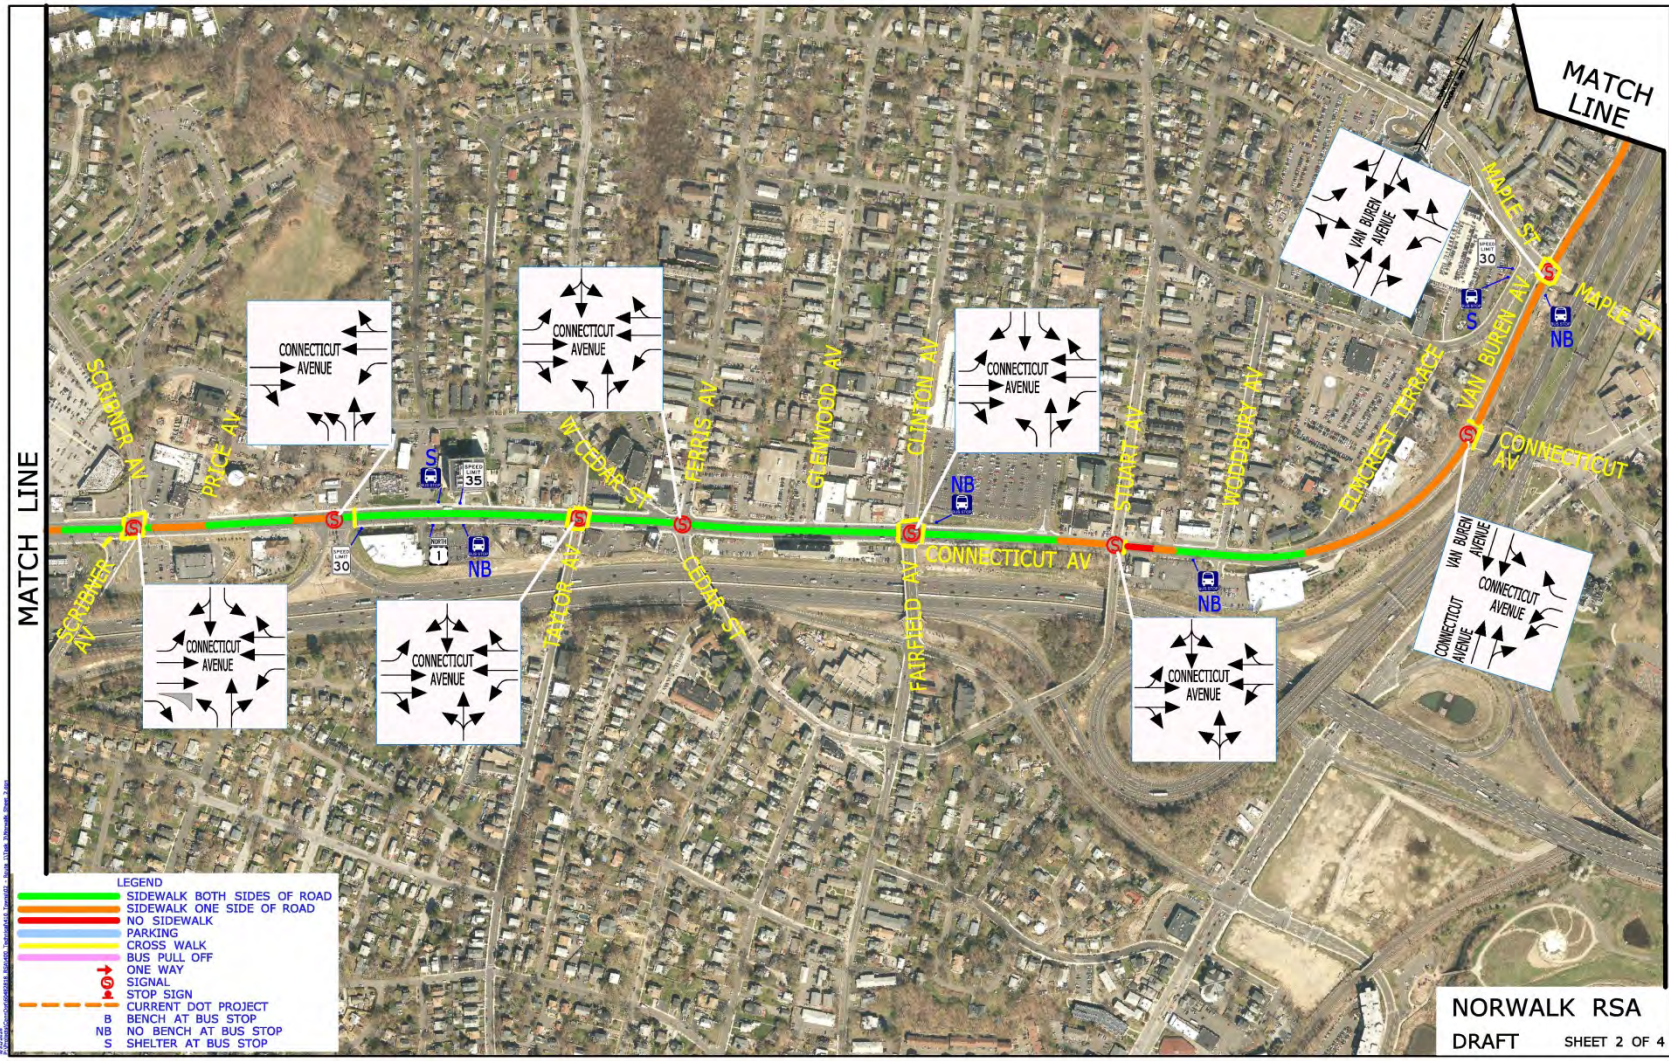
Connecticut Avenue and Van Buren Avenue, Norwalk Route 1 – Road Geometrics
